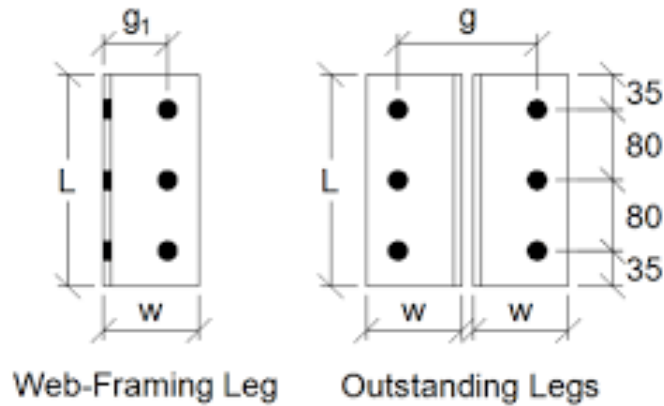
Design details for bolted double-angle beam-to-column connection (Canadian Institute of Steel Construction 2015)
